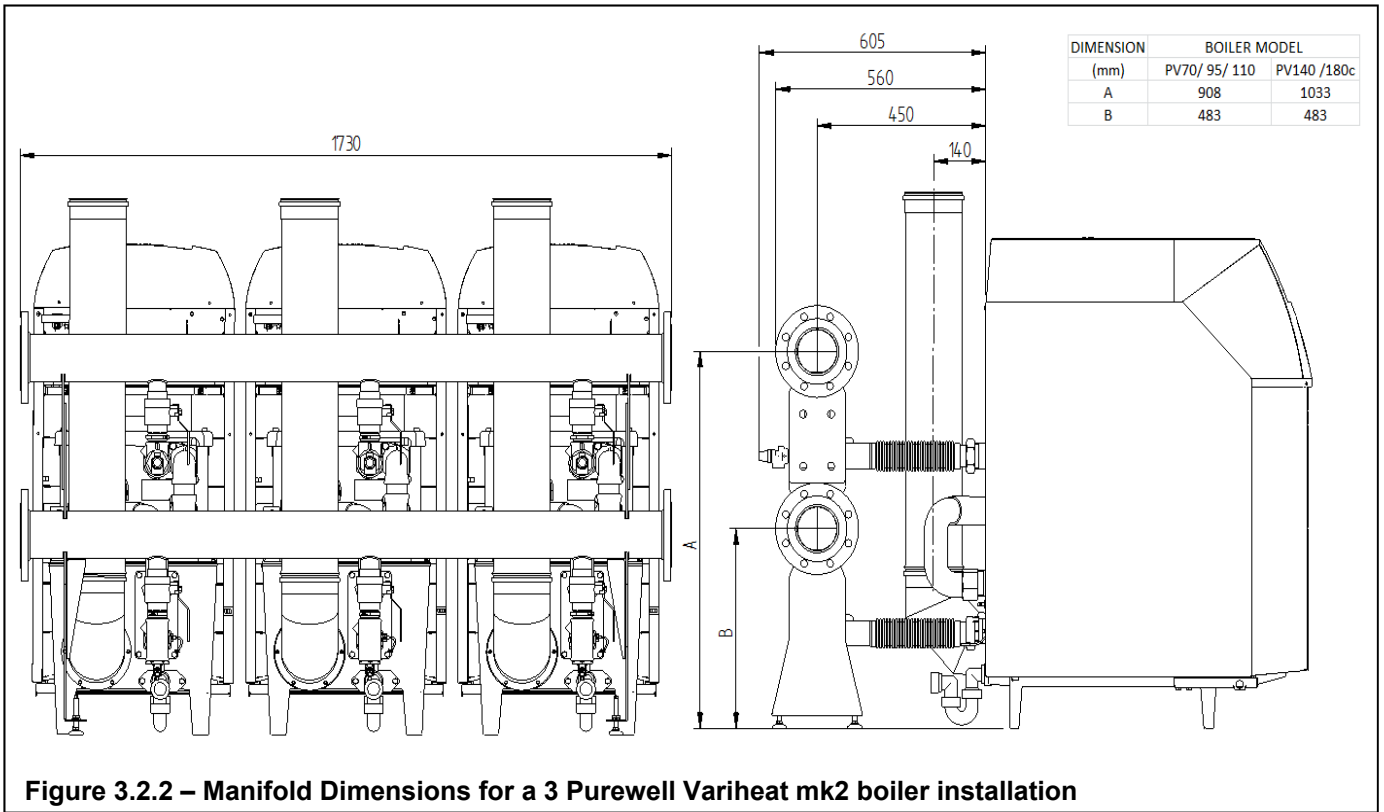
Manifold Dimensions for a 3 Purewell Variheat mk2 boiler installation
